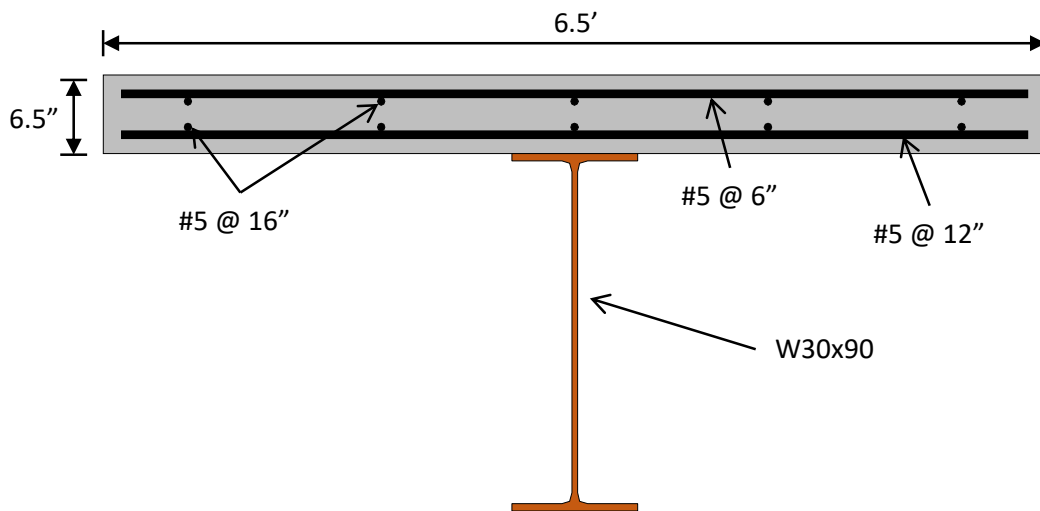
Cross Section View of Large-Scale Test Specimens
